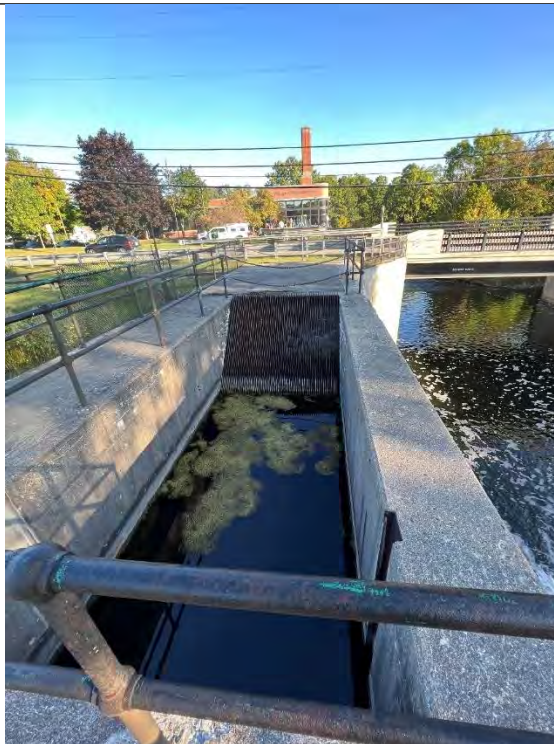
Opening at Top of Penstock Intake Deck Looking Downstream
